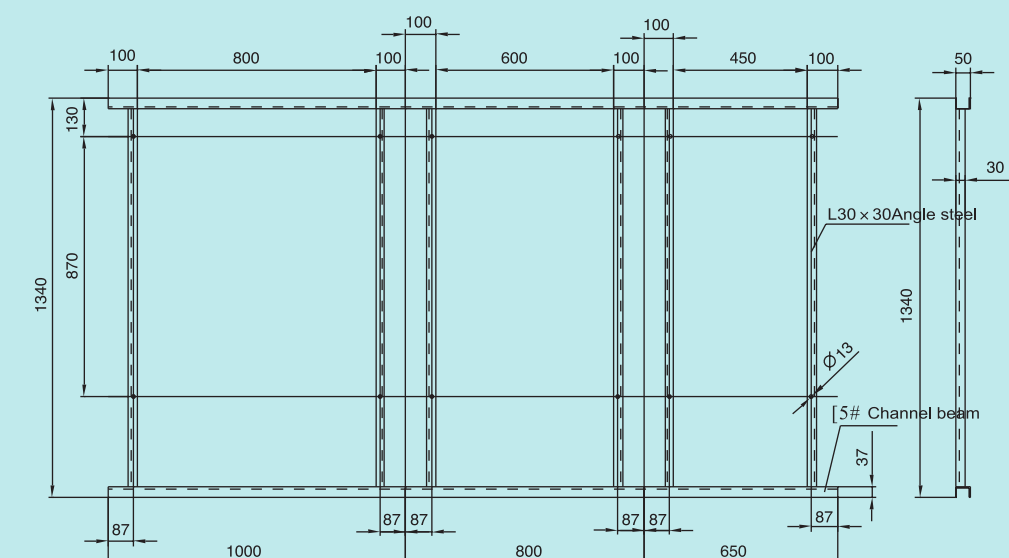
Typical basic frame foundation (for 1000mm/800mm/650mm width dimension model)
